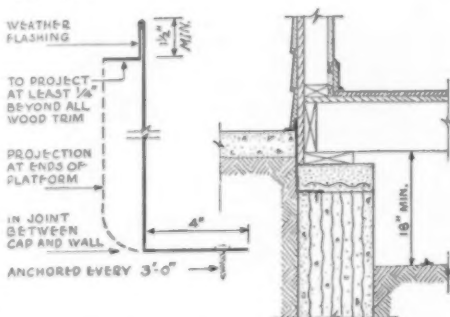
Metal apron inserted between concrete slab and woodwork, anchored to unit-type foundation, and capped with reinforced concrete. Apron serves as weather flashing as well as termite barrier⁽¹¹⁾
